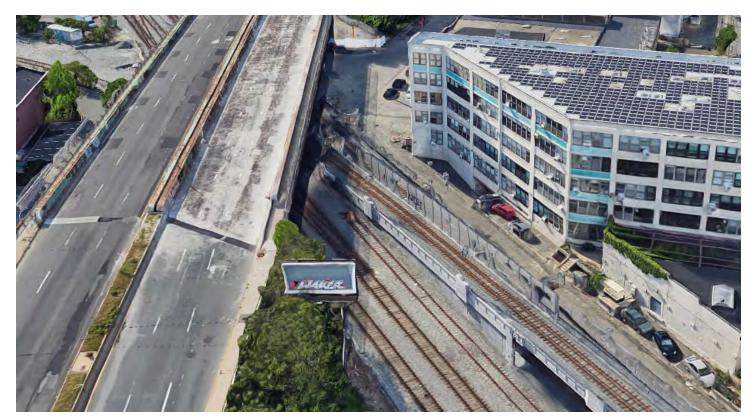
Modes – Light Rail: Challenging Tie-Ins to the North Amidst Elevated Green Line Extension and Elevated McGrath Highway (Credit: Google Earth)
